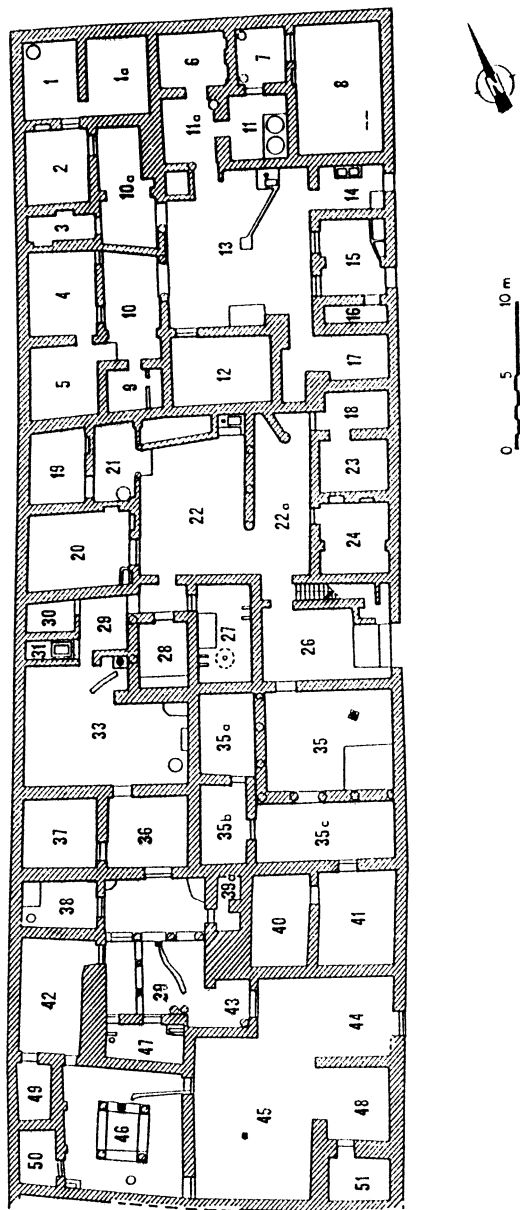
House F in the middle block. Plan of the house, latest stage (7th-9th century AD).
